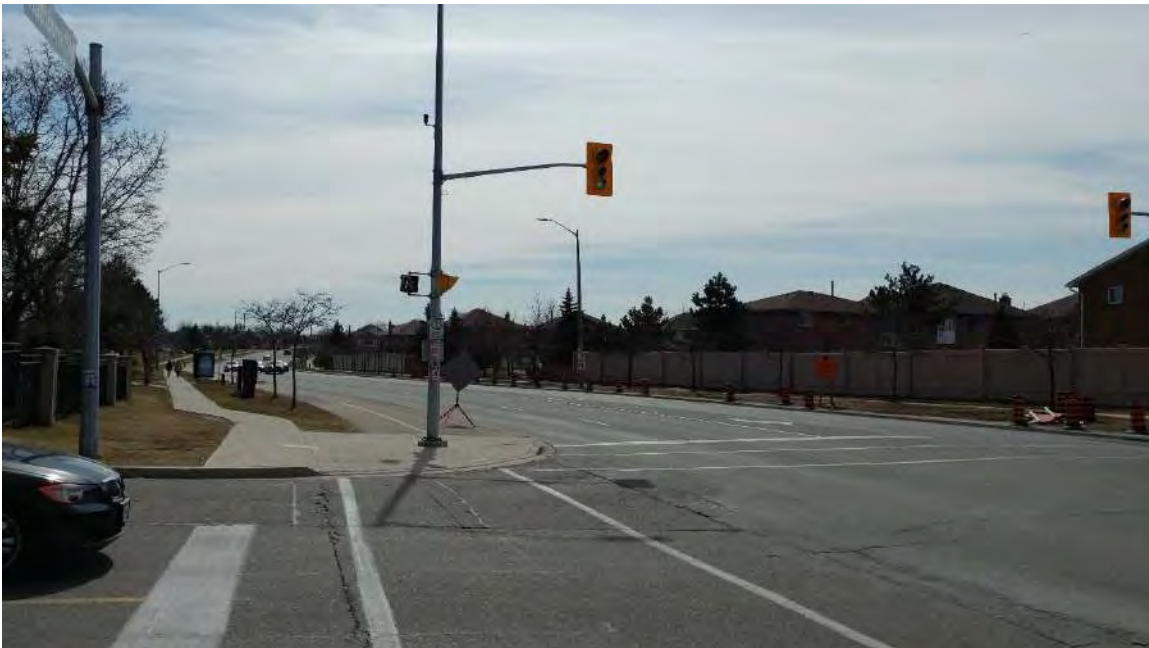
View of Rathburn Road West from Rathburn Road West (looking southwest).
